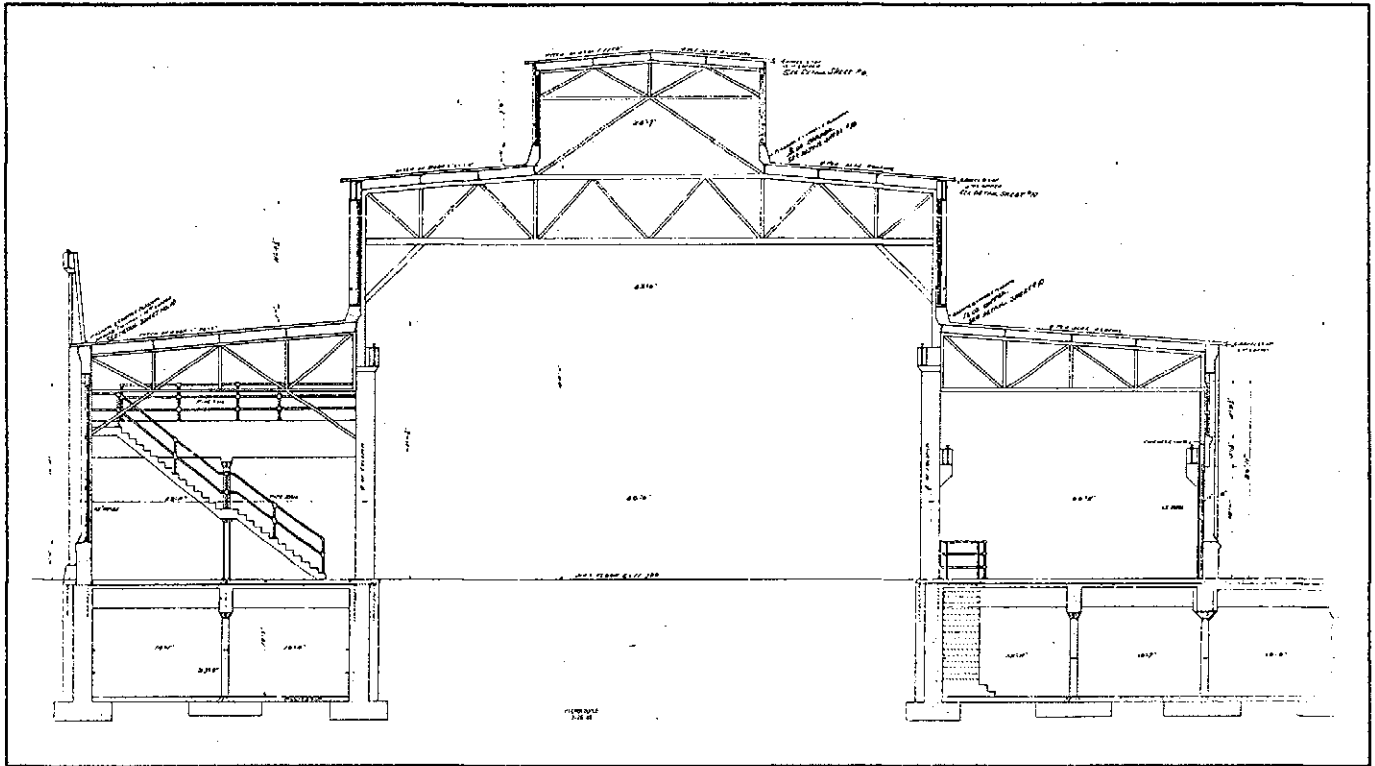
Foundry (now Forge Shop, No. 200). Transverse Section.
